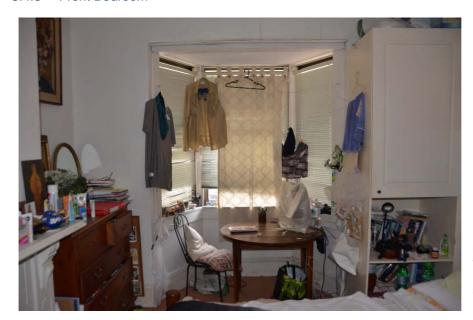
Front bedroom looking toward the front bay window. Walls are lined with paper. Original skirtings. Joinery to window removed.
